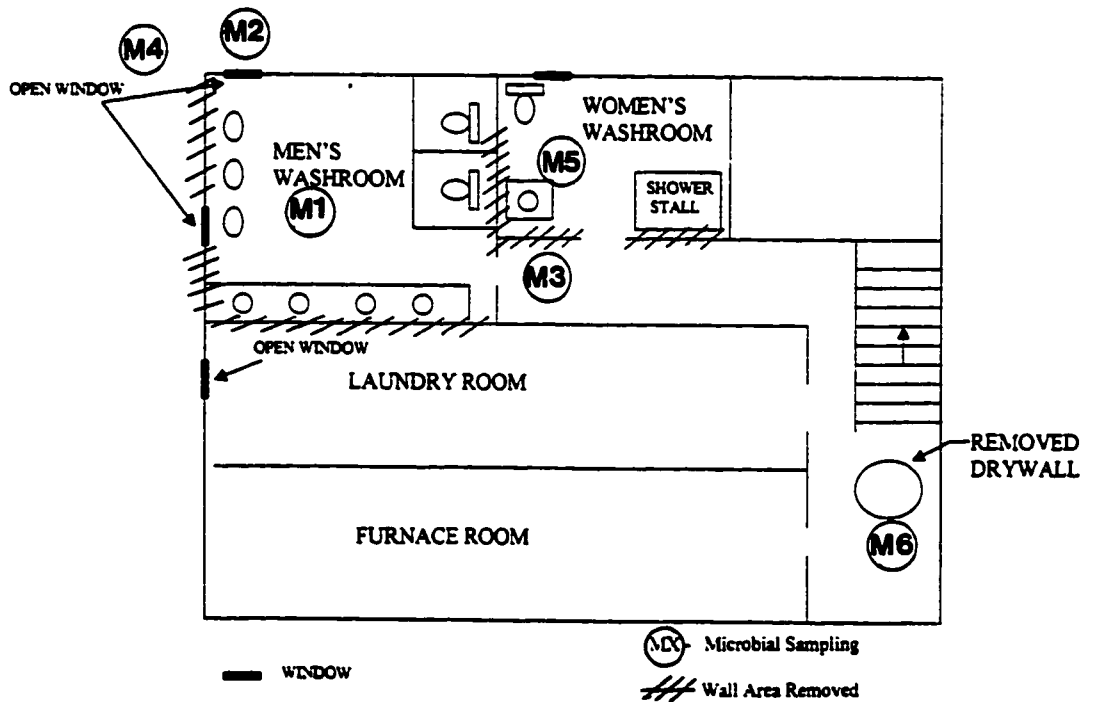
Floorplan of Removal of Water Damaged Drywall Activity Test Site No.2
